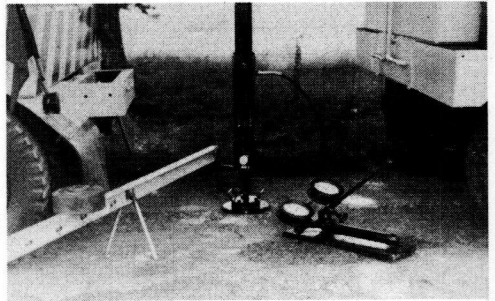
Plate Bearing Test Jack and Incidental Equipment - Ohio
